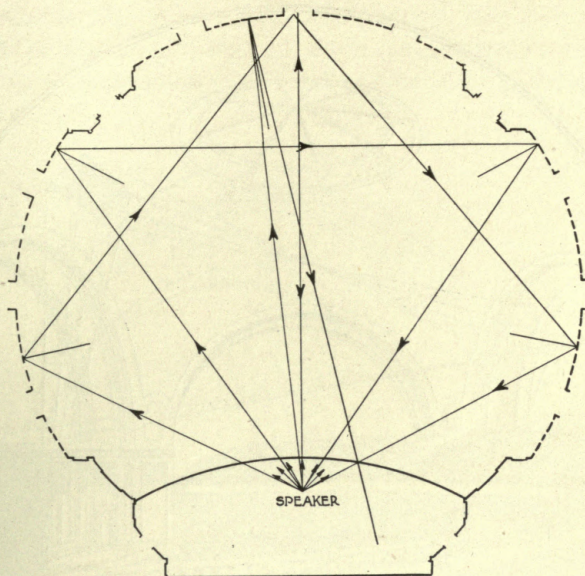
PLAN OF AUDITORIUM SHOWING ACTION OF REAR WALL ON THE SOUND.
